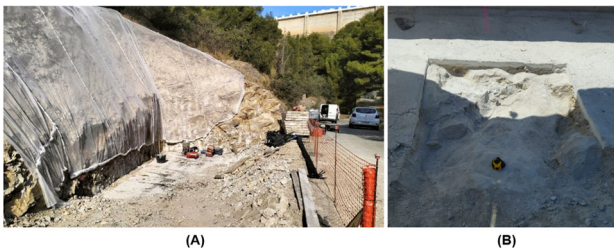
(A) Another view of the test site before executing the civil works. (B) Outcrop of the rock at the contact plane of one of the blocks.
